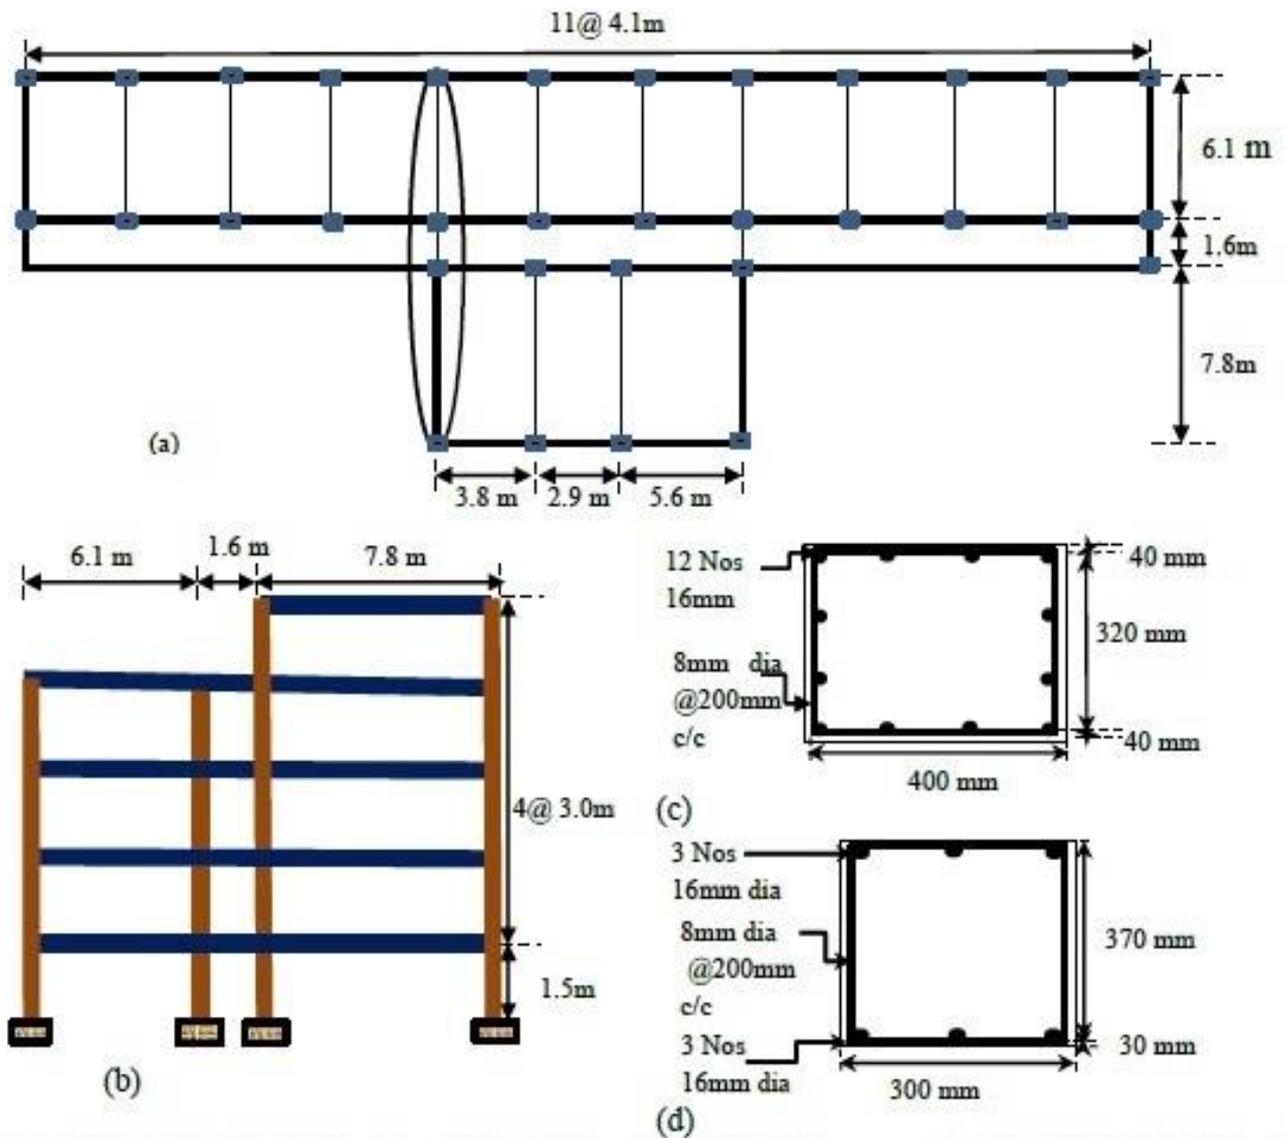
The details of the building frame (a) the building plan, (b) the 2D frame, (c) the details of the column sections and (d) the details of the beam sections considered for SFA
